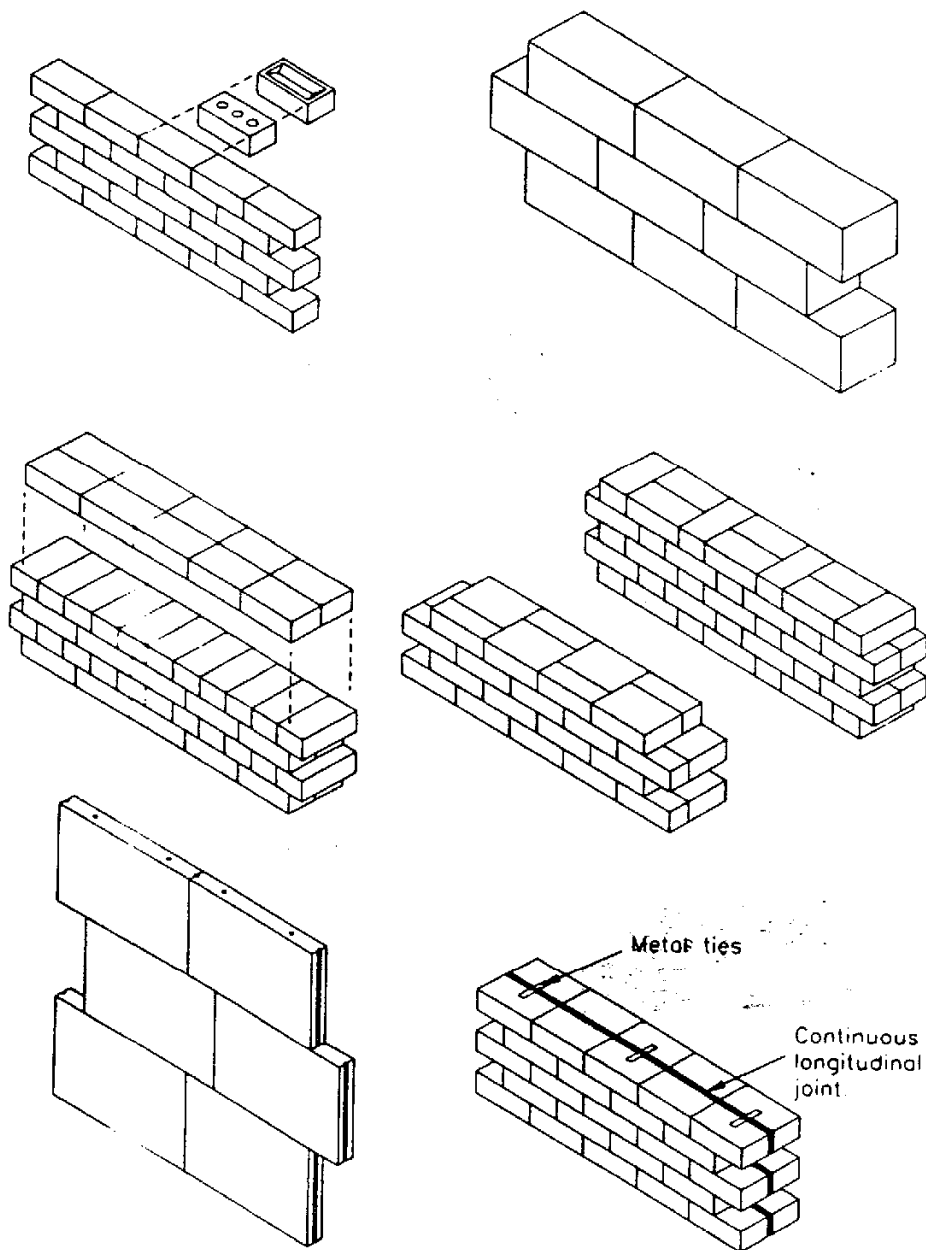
Examples of bonding arrangements using Group 1 masonry units.
